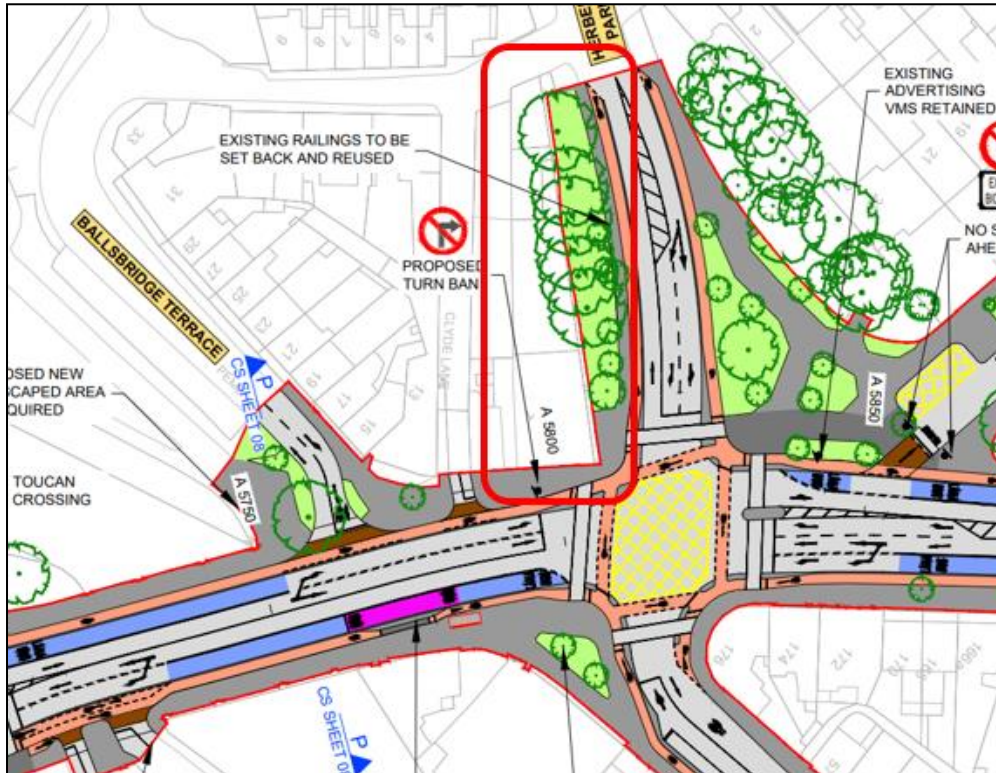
Proposed new Layout at Roly's Bistro Merrion Road
